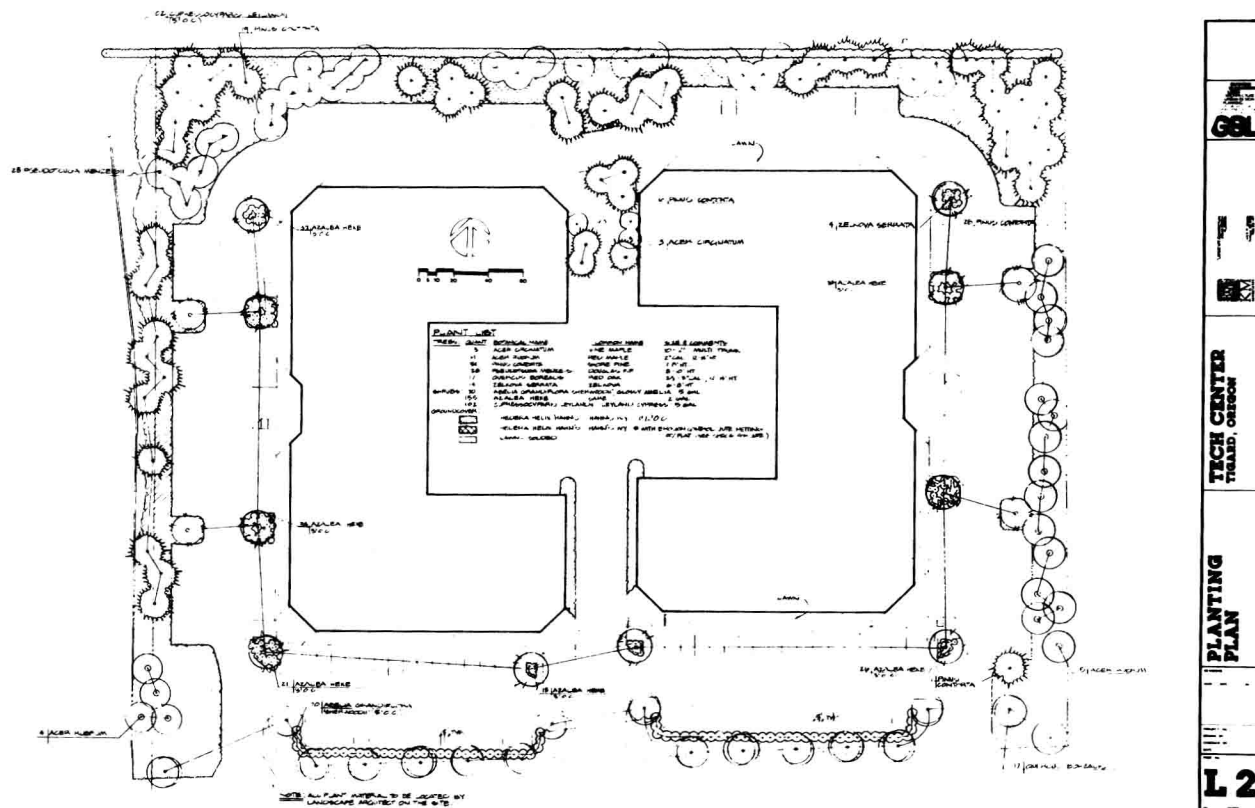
Landscape plan. Courtesy Guthrie, Slusarenko, Leeb Architecture Urban Design Planning; KM Associates Landscape Architecture.
